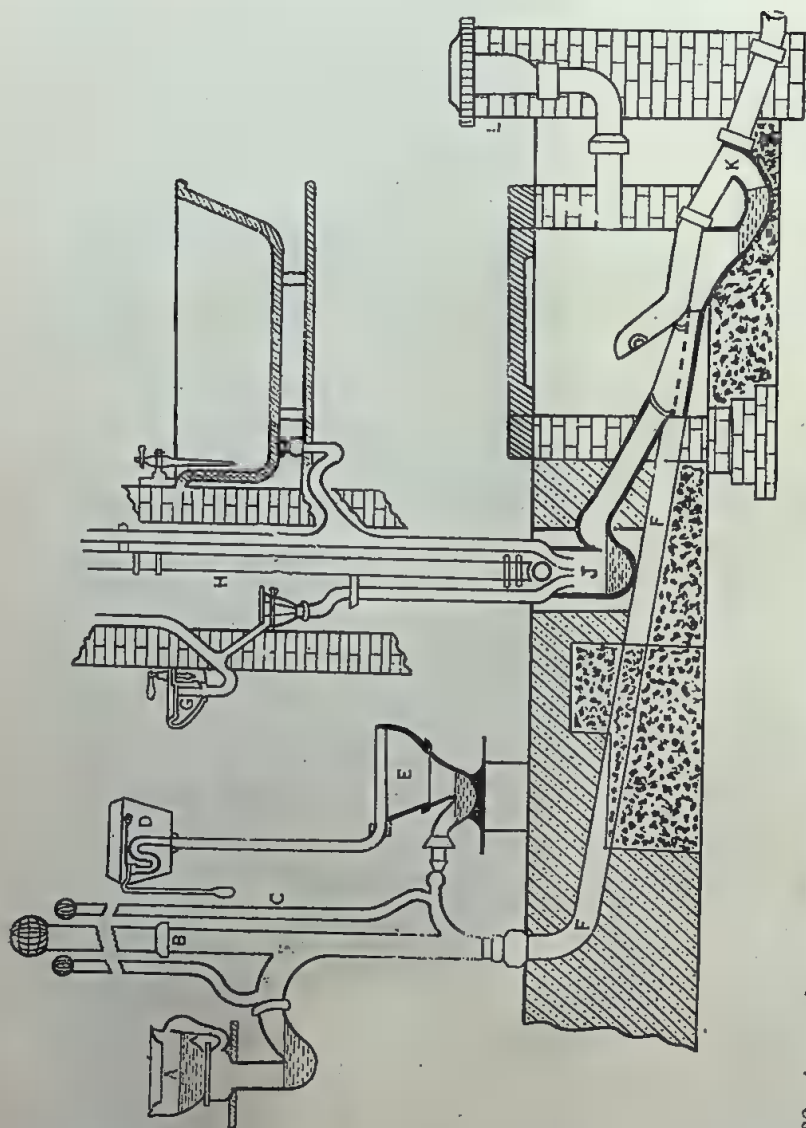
A complete system of house drainage. A & E are two closets which open into the soil pipe B. C. Anti siphonage pipe, D. flushing cistern which opens into closet E, F. house drain, G. washbasin, I. bath tub, J. Gully trap, K. Intercepting trap, L. Inlet opening.
